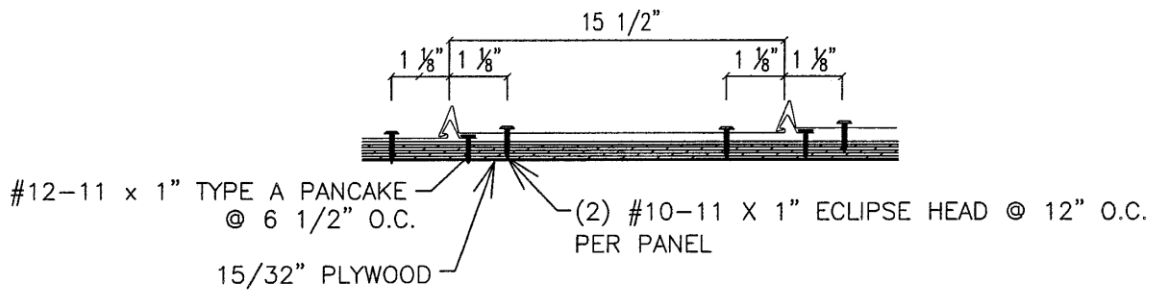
1.5" Nailstrip Panel Detail (Minimum 24-Gauge)
